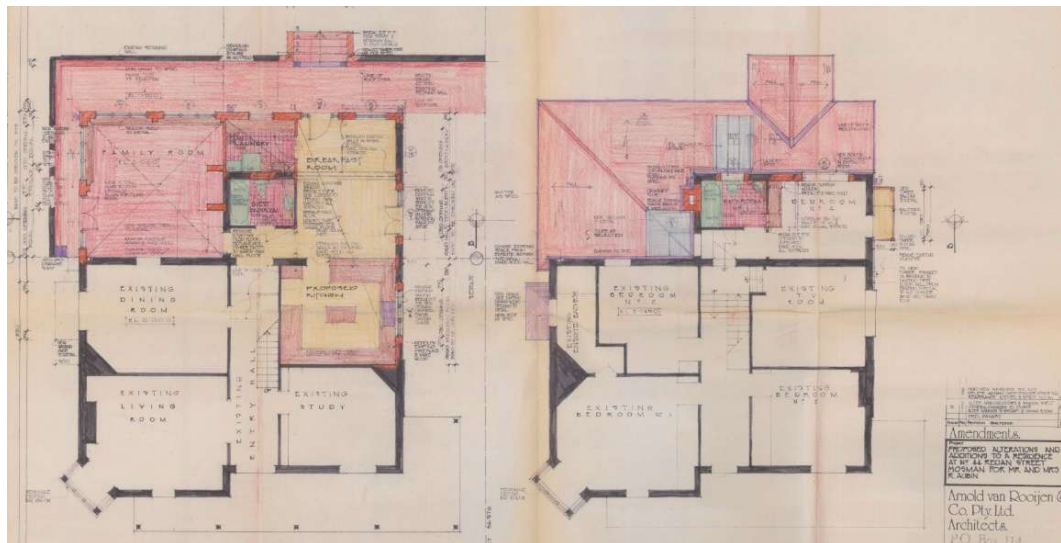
Approved plans 1983 plans for alterations and additions and changes to the floor plan.
